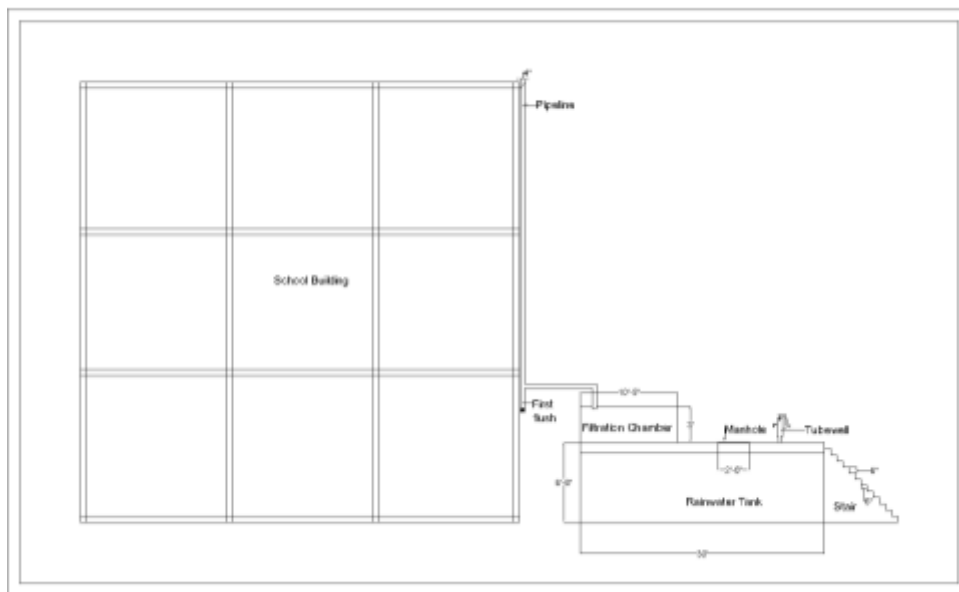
Cross-section view of an example Institution-scale rainwater harvesting system
